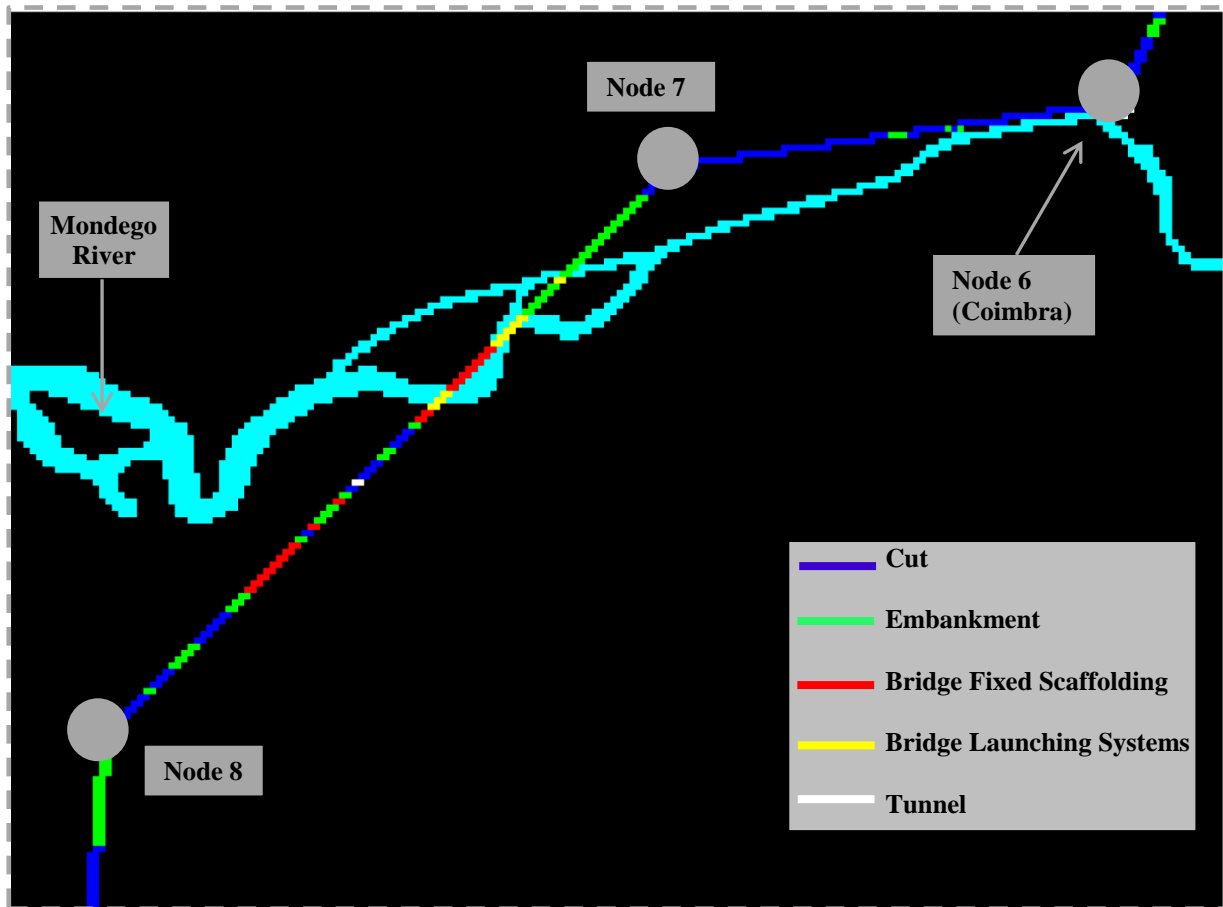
Detail of the HSR plan view overlaying the ground elevation map between Aveiro and Leiria.
